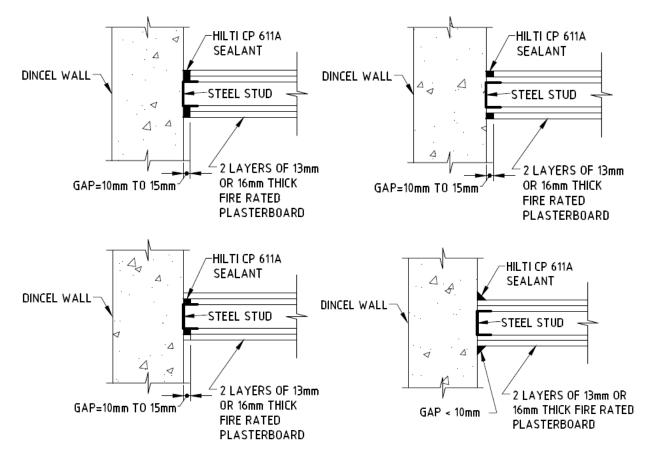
Plan view of T-joint (two joint widths: 10-15 mm, <10 mm)⁹
